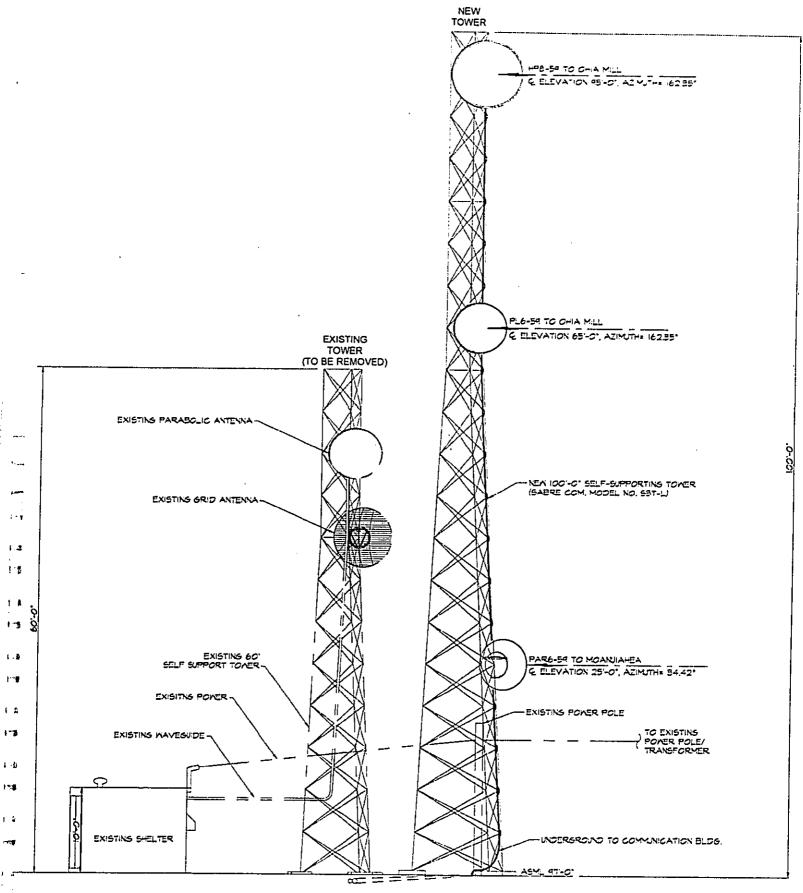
E Kailua Police Station / Elevation Plan (looking north)
